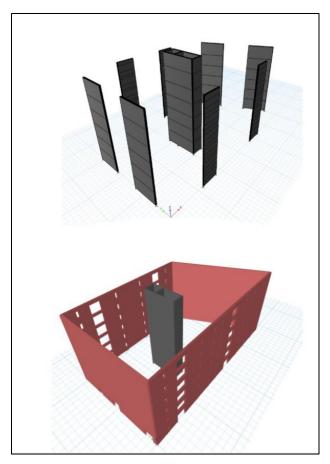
Shear Wall Panels Would be Fit to each of the Four Exterior Walls of the Hoosac Stores Building and Around the Elevator Shaft to Provide Earthquake and Wind Shear Stability (NPB, 2020)
